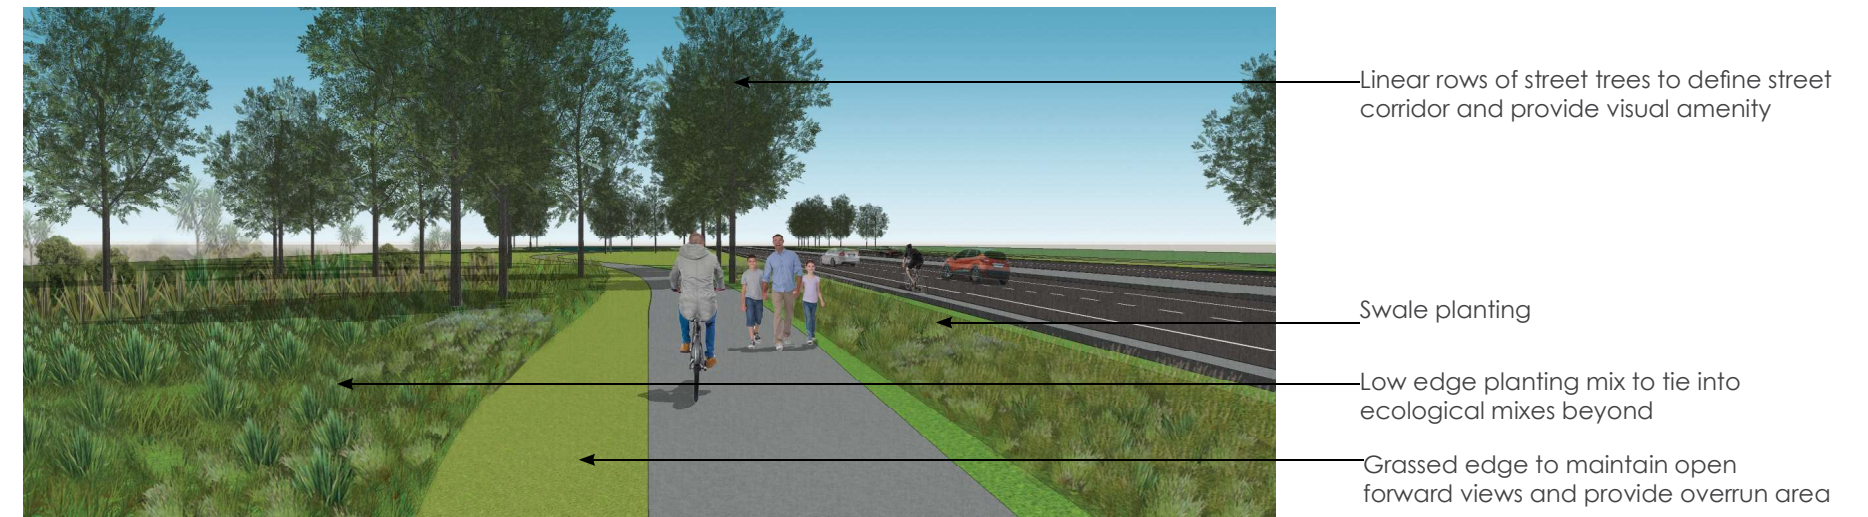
TYPICAL WHATUKOORURU DRIVE STREETSCAPE
